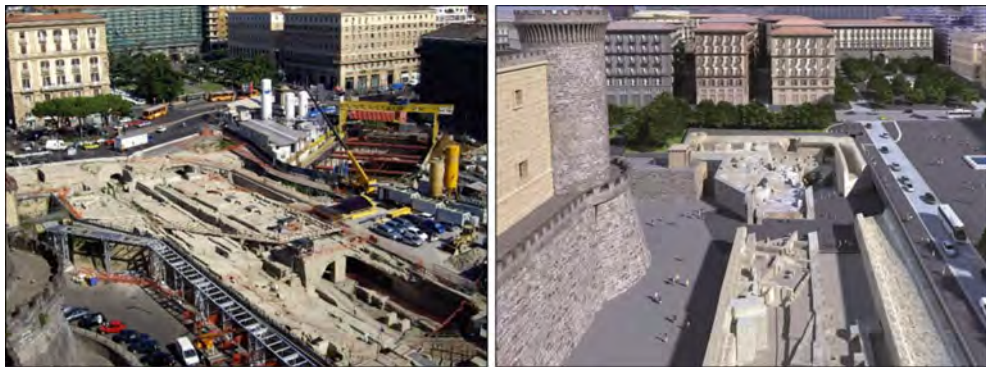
Unearthed sixteenth century fortification walls with the adjacent Maschio Angioino castle: site under construction and rendering of the final layout.
